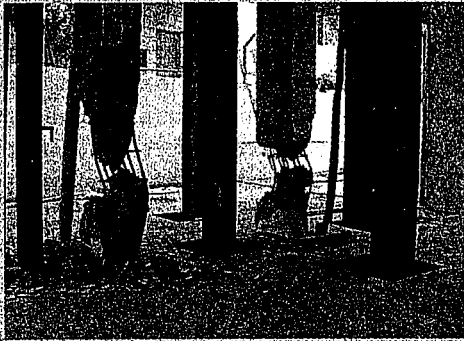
Column failures due to non-ductile detailing
